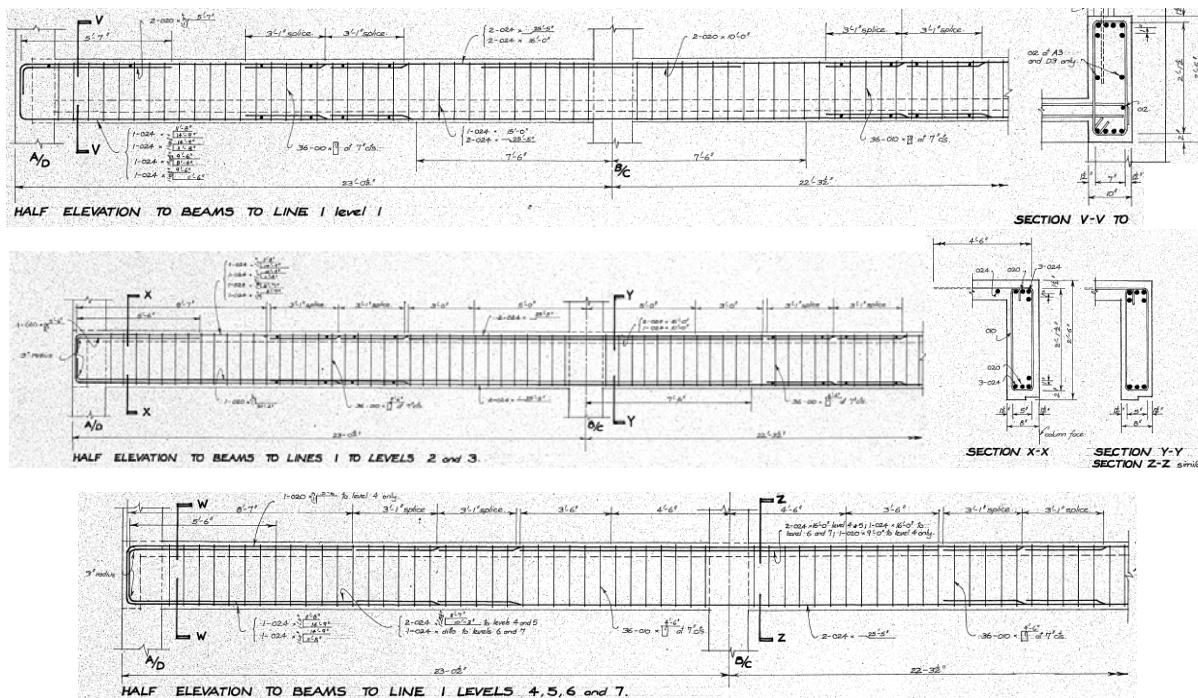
Example of beam reinforcement details in the Longitudinal Frame 1.
